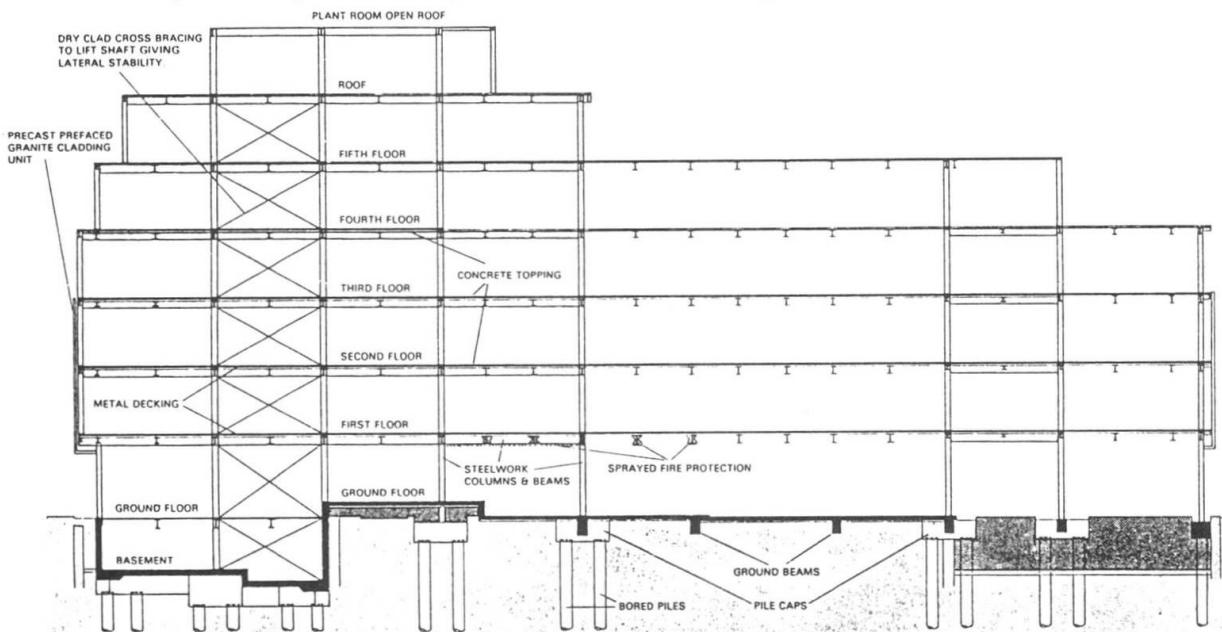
Cross section showing wind bracing. (Cutlers Court, London.)
